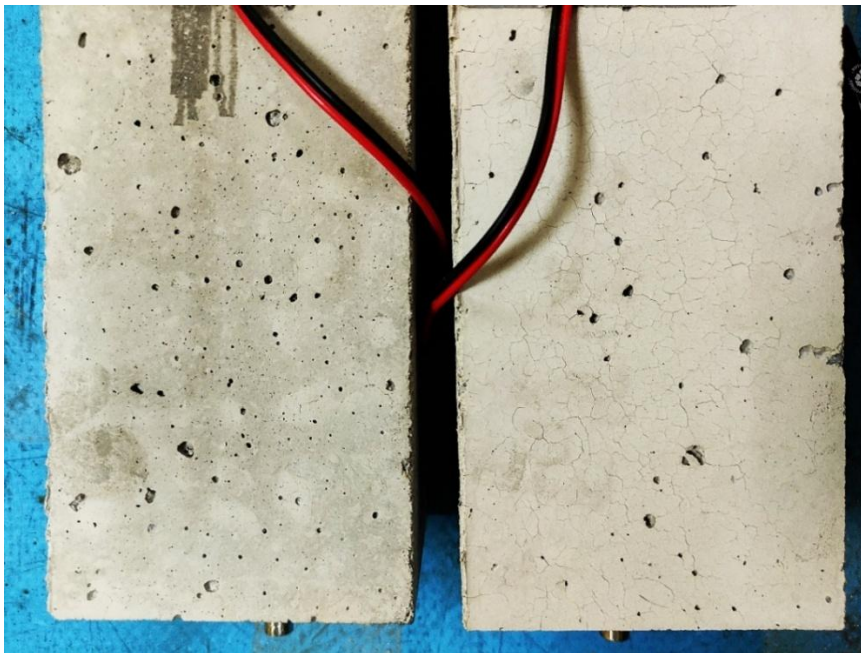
Surface cracking (crazing) of the AAC samples: SHA-S (left) and R (right)
